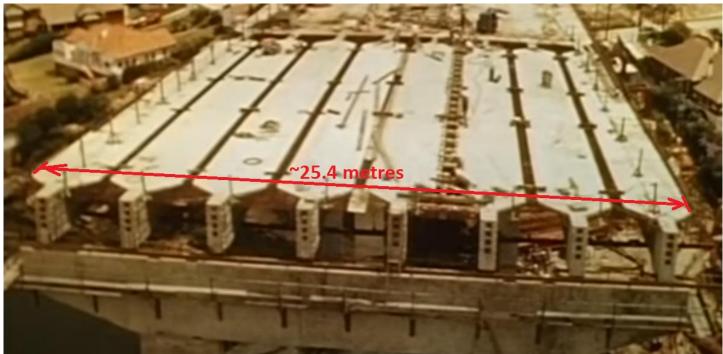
Gladesville Bridge construction 1964 – 8 deck 'T' beams adequate for 8 traffic lanes
